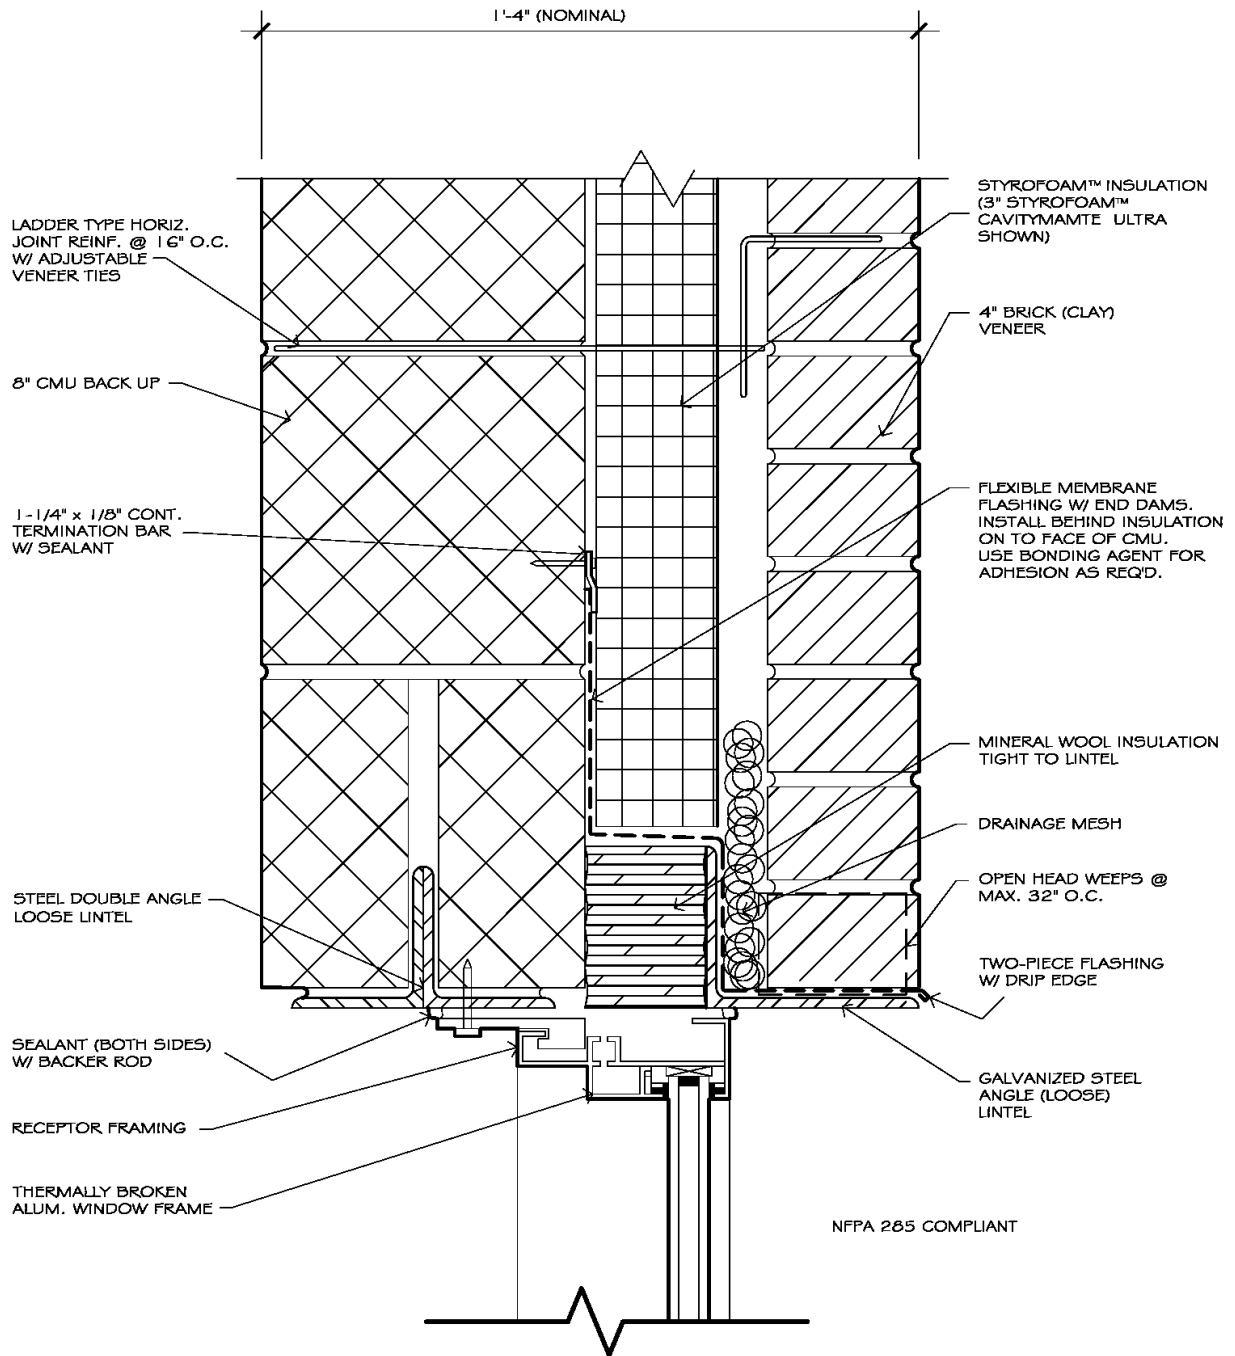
Window / Door Opening Detail w/Mineral Wool & Fire Treated Wood Blocking
